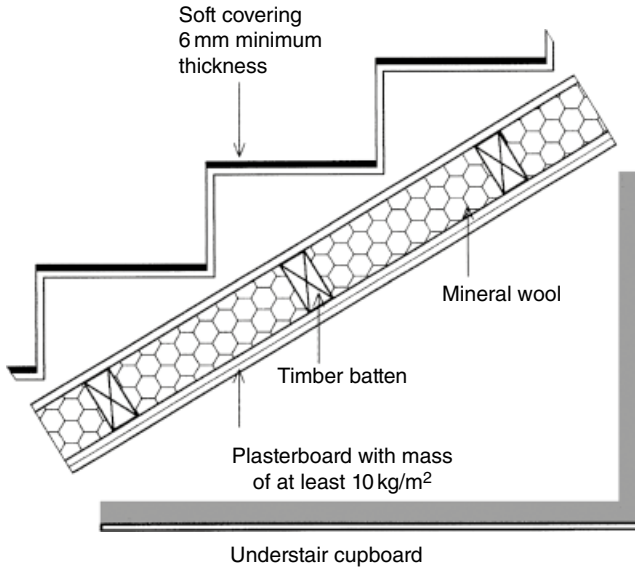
Stair treatment assuming an under stair cupboard.
